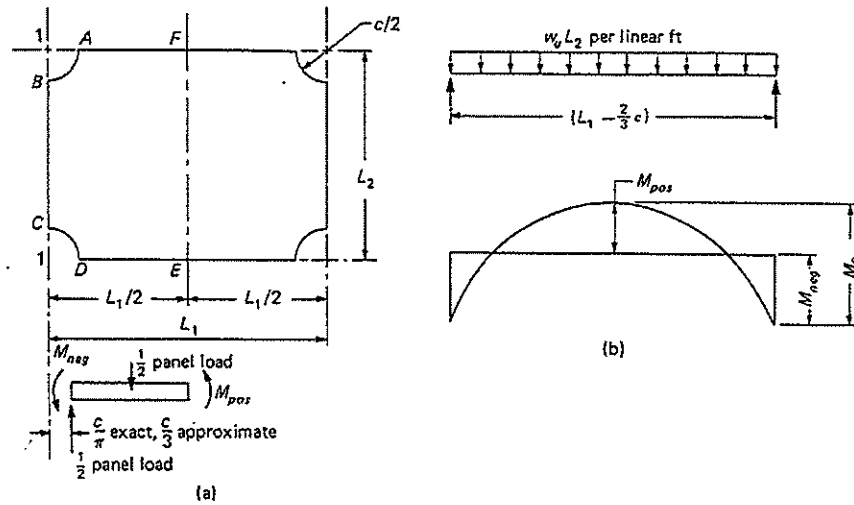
Statics of a typical interior panel in a flat slab floor system.
